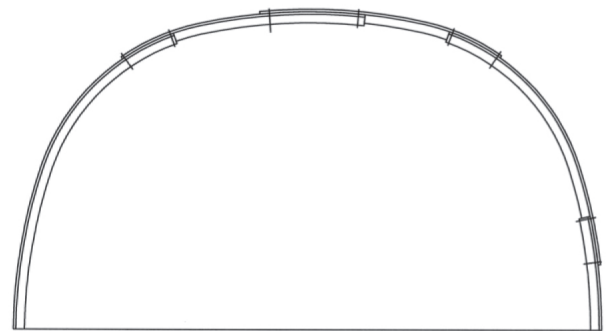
Universal ŁPS II frame in the asymmetrical version with a parted side section
